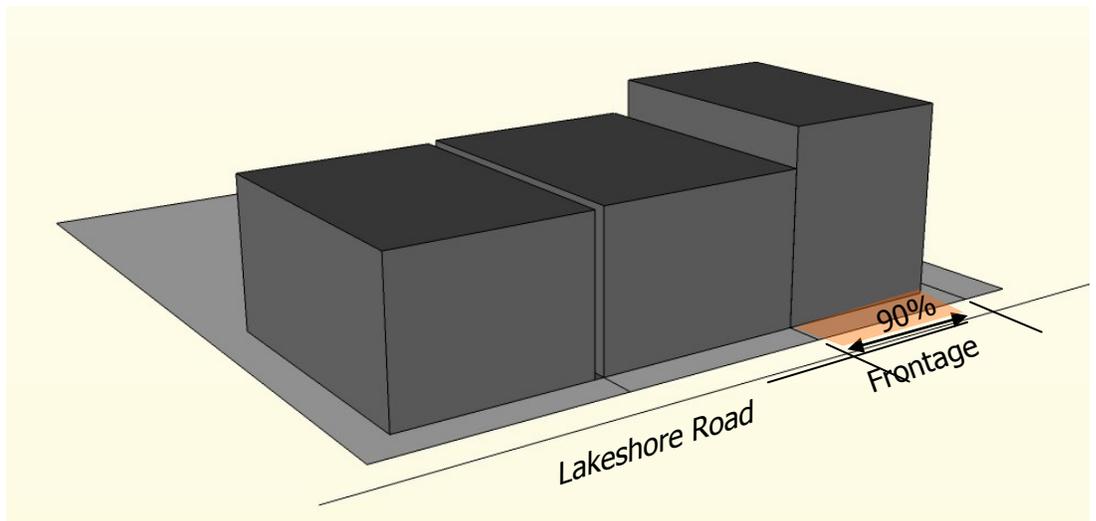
A minimum of 90% of the building shall front onto Lakeshore Road East and West and be within 0.0 m to 3.0 m
